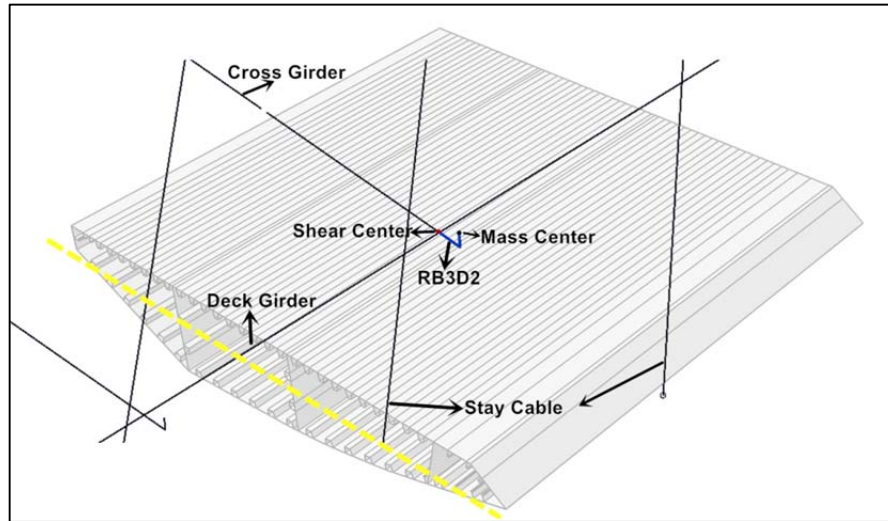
(b): Arrangement of RB3D2 between shear centre and mass centre of bridge deck.
